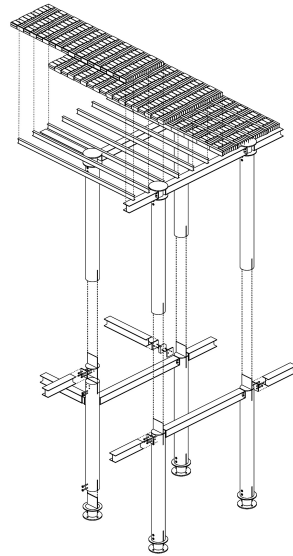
Structural diagram: steel and palm in a hybrid column (Source: by author).
